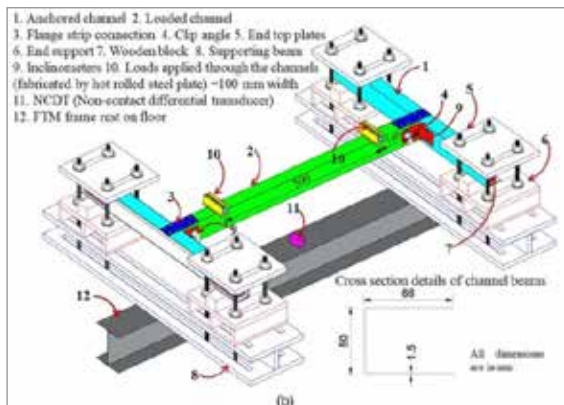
CFS beam-to-beam connection with clip-angle and flange-strip
